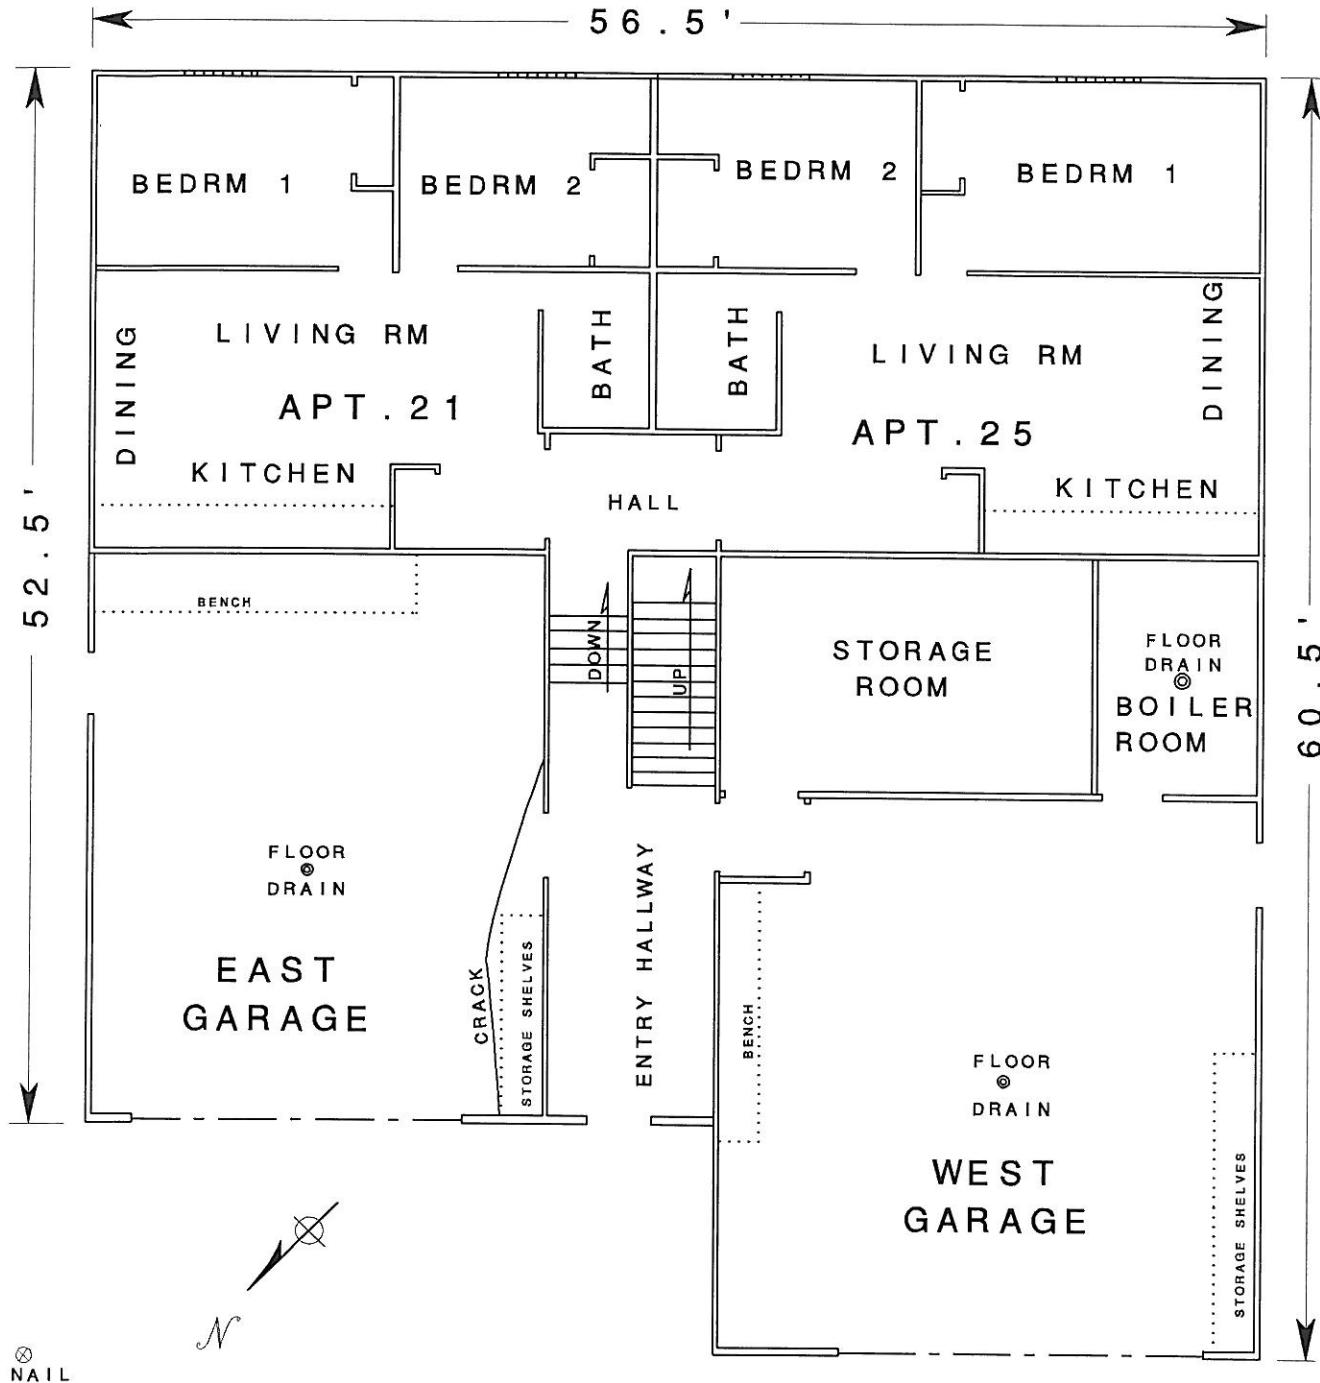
Floor plan of the lower levels - garage and basement apartments.
